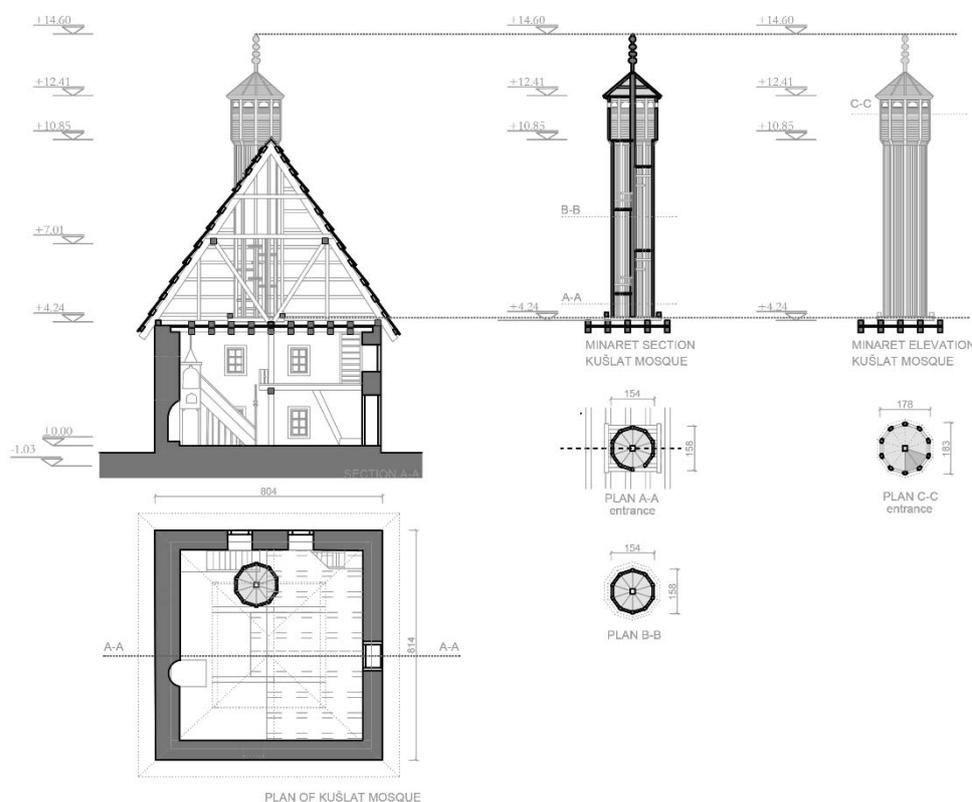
Kušlat mosque section, plan and minaret details. (Source: by authors, 2018)
